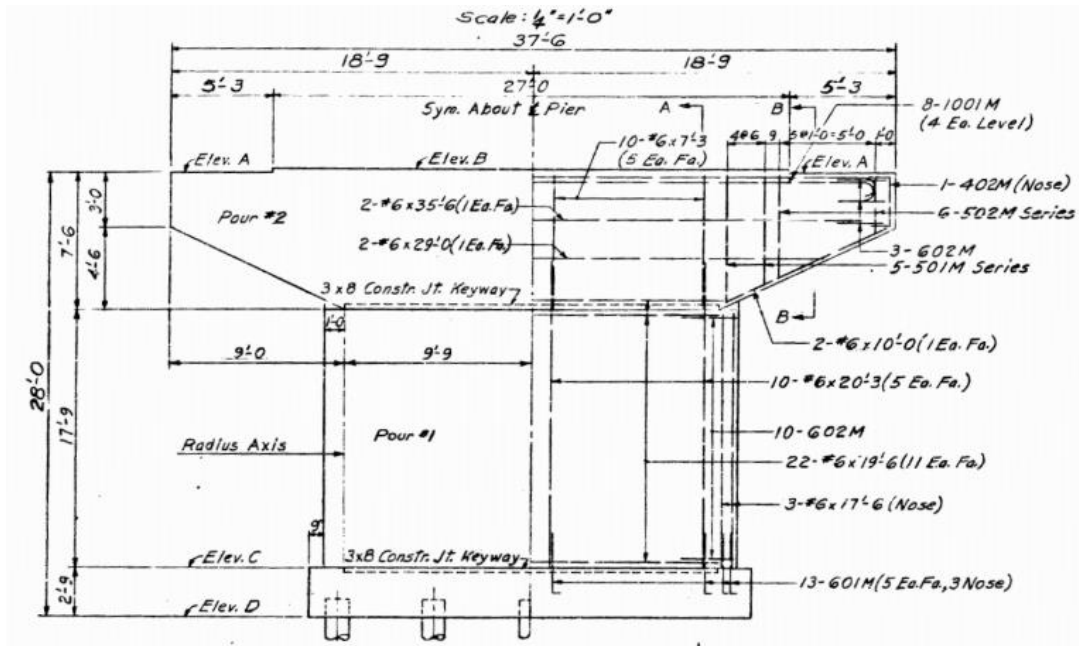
System C: Transverse Elevation of an Interior Pier (NBI 33240) (1978)
